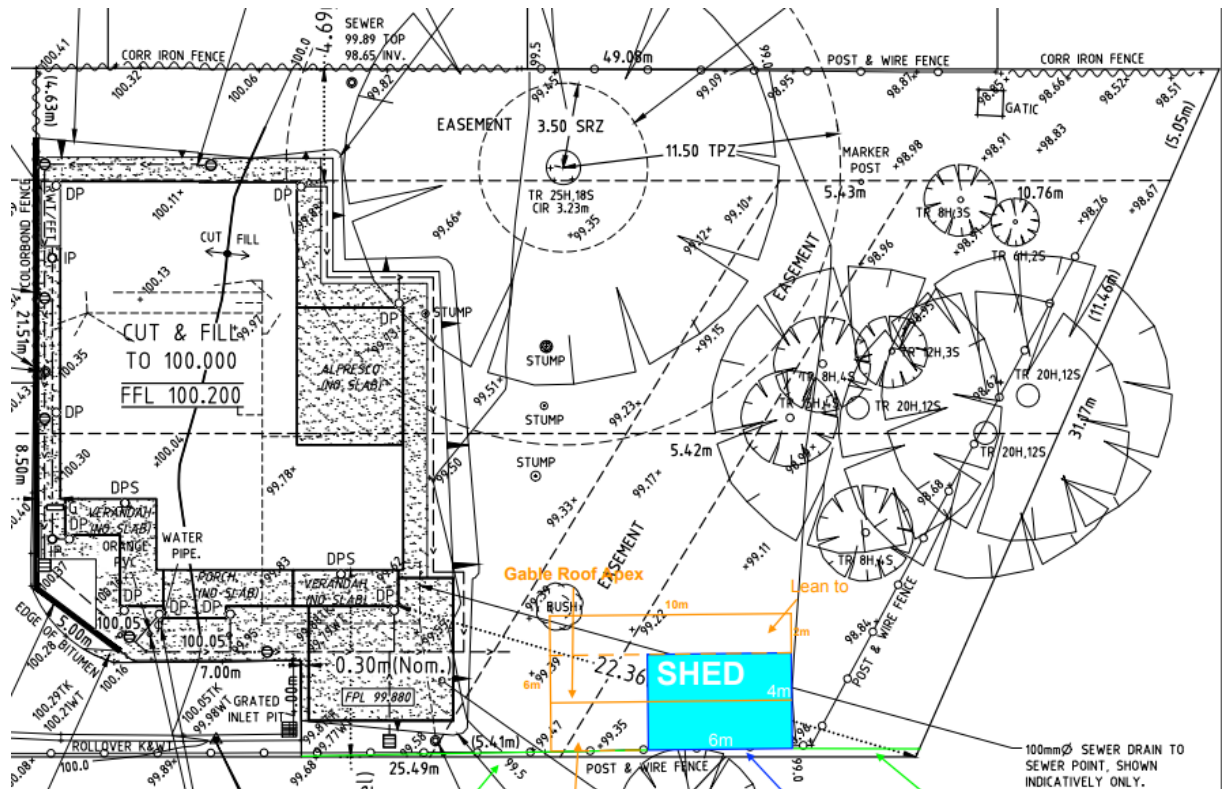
Location of outbuilding and carport depicted in orange and blue outside the Building Envelope
